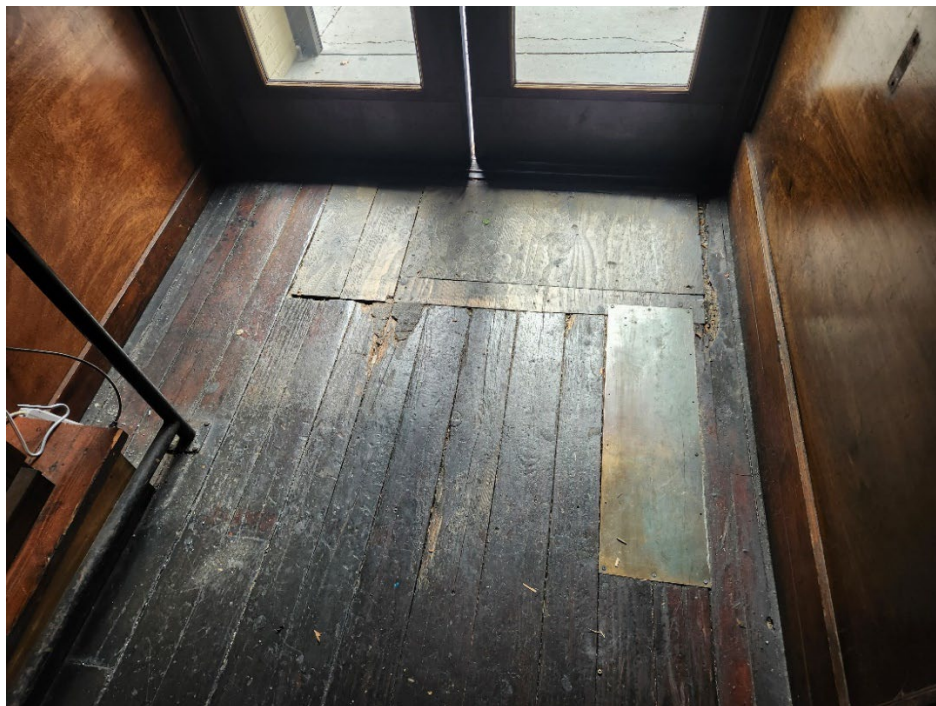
Damaged flooring at the south ramped (main entrance), first floor.
